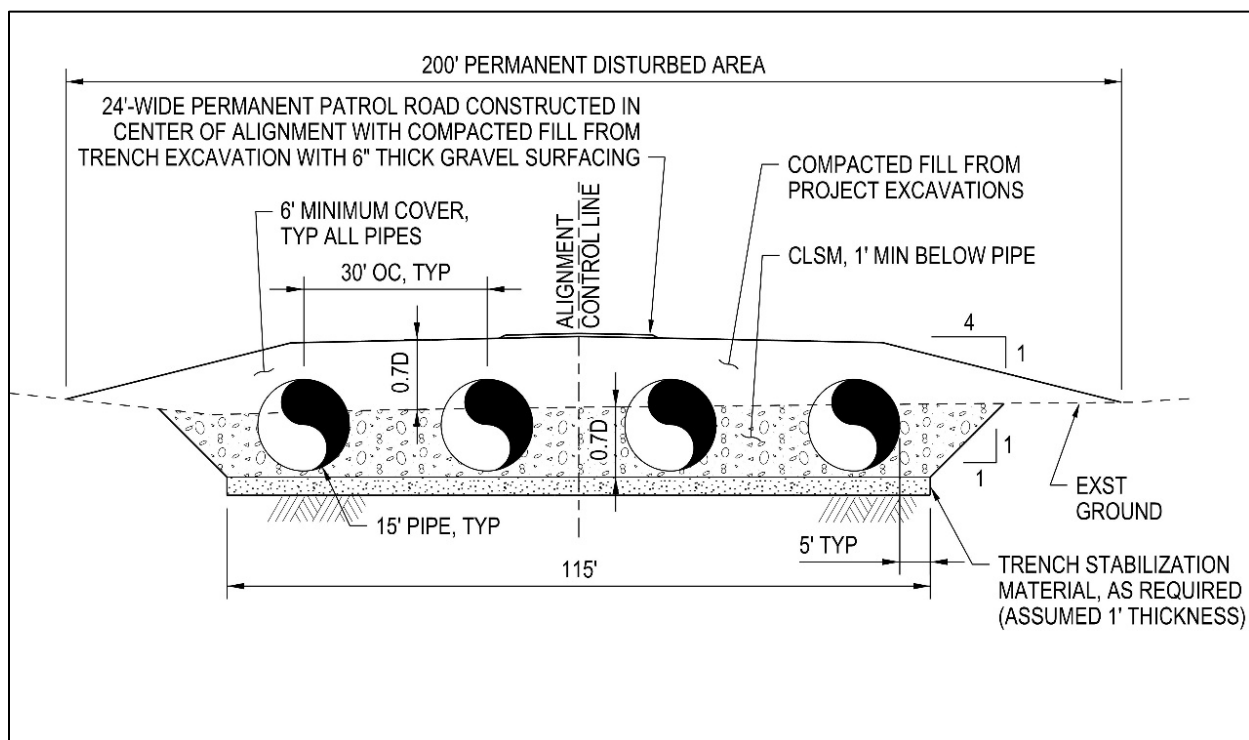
Typical Pipeline Trench between BRPP and Bethany Reservoir
